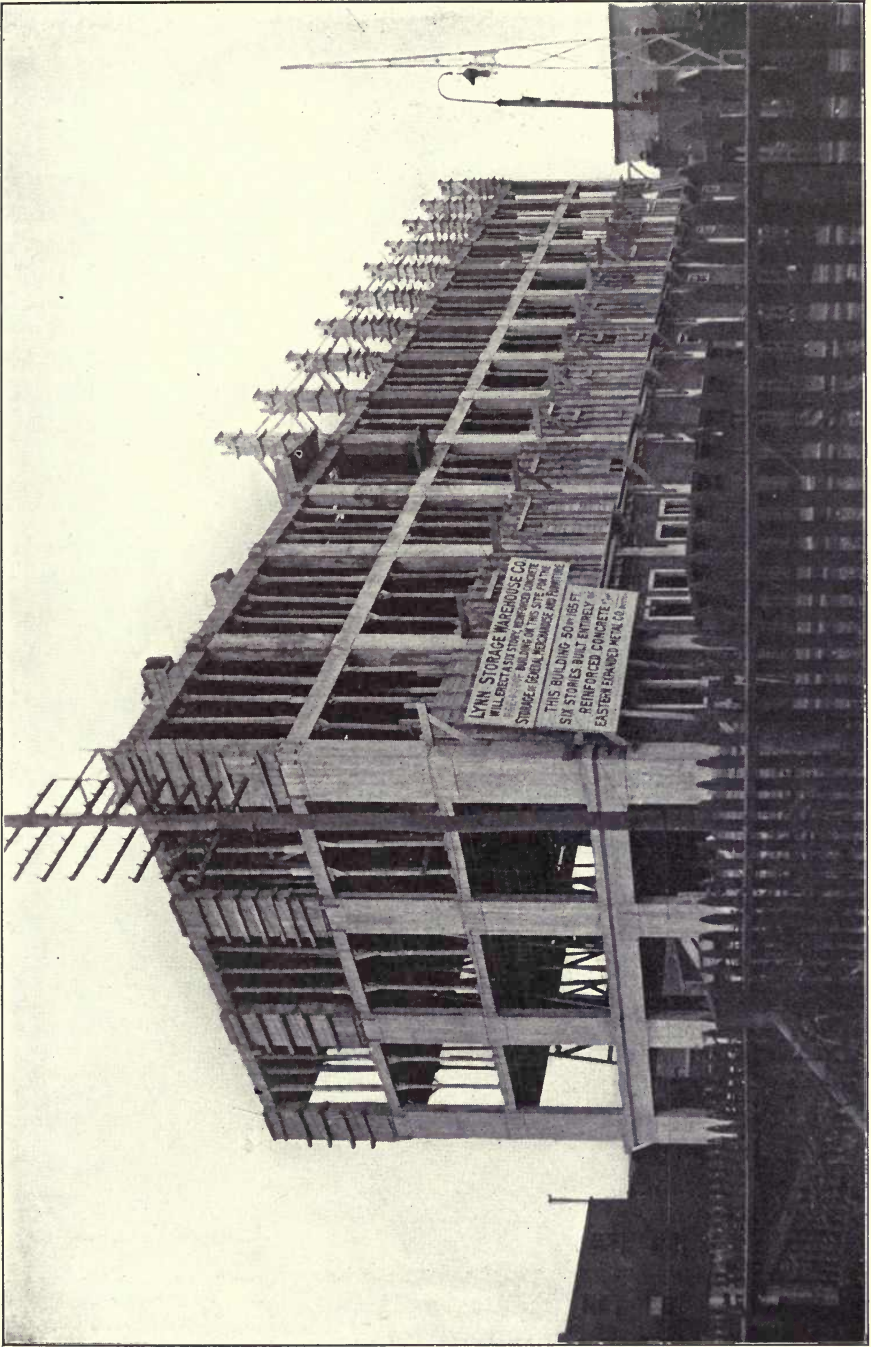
is taken after the completion of the concrete work of the fifth floor. The forms are removed from the columns and floor of the lower stories, but the supports are still left under the beams and girders of the fourth floor. The wall panels are completed in the first story and the forms for the second story panels are in place on the side of the building.
